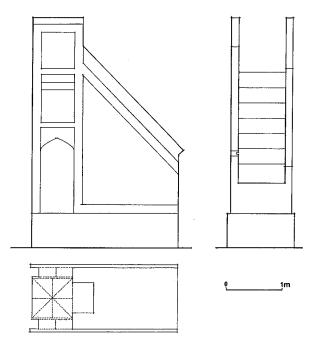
Kāšān, Masǧid-i Maydān : plan and elevations of minbar.
